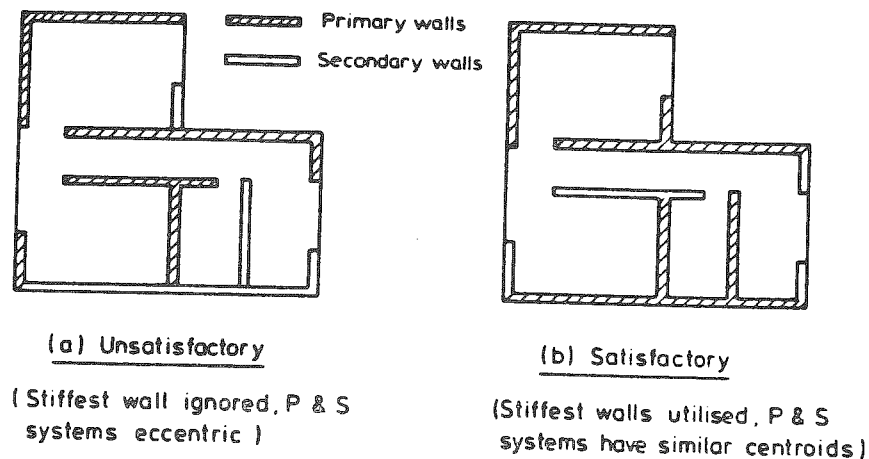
EXAMPLE OF SUBDIVISION OF WALLS INTO PRIMARY AND SECONDARY SYSTEMS
